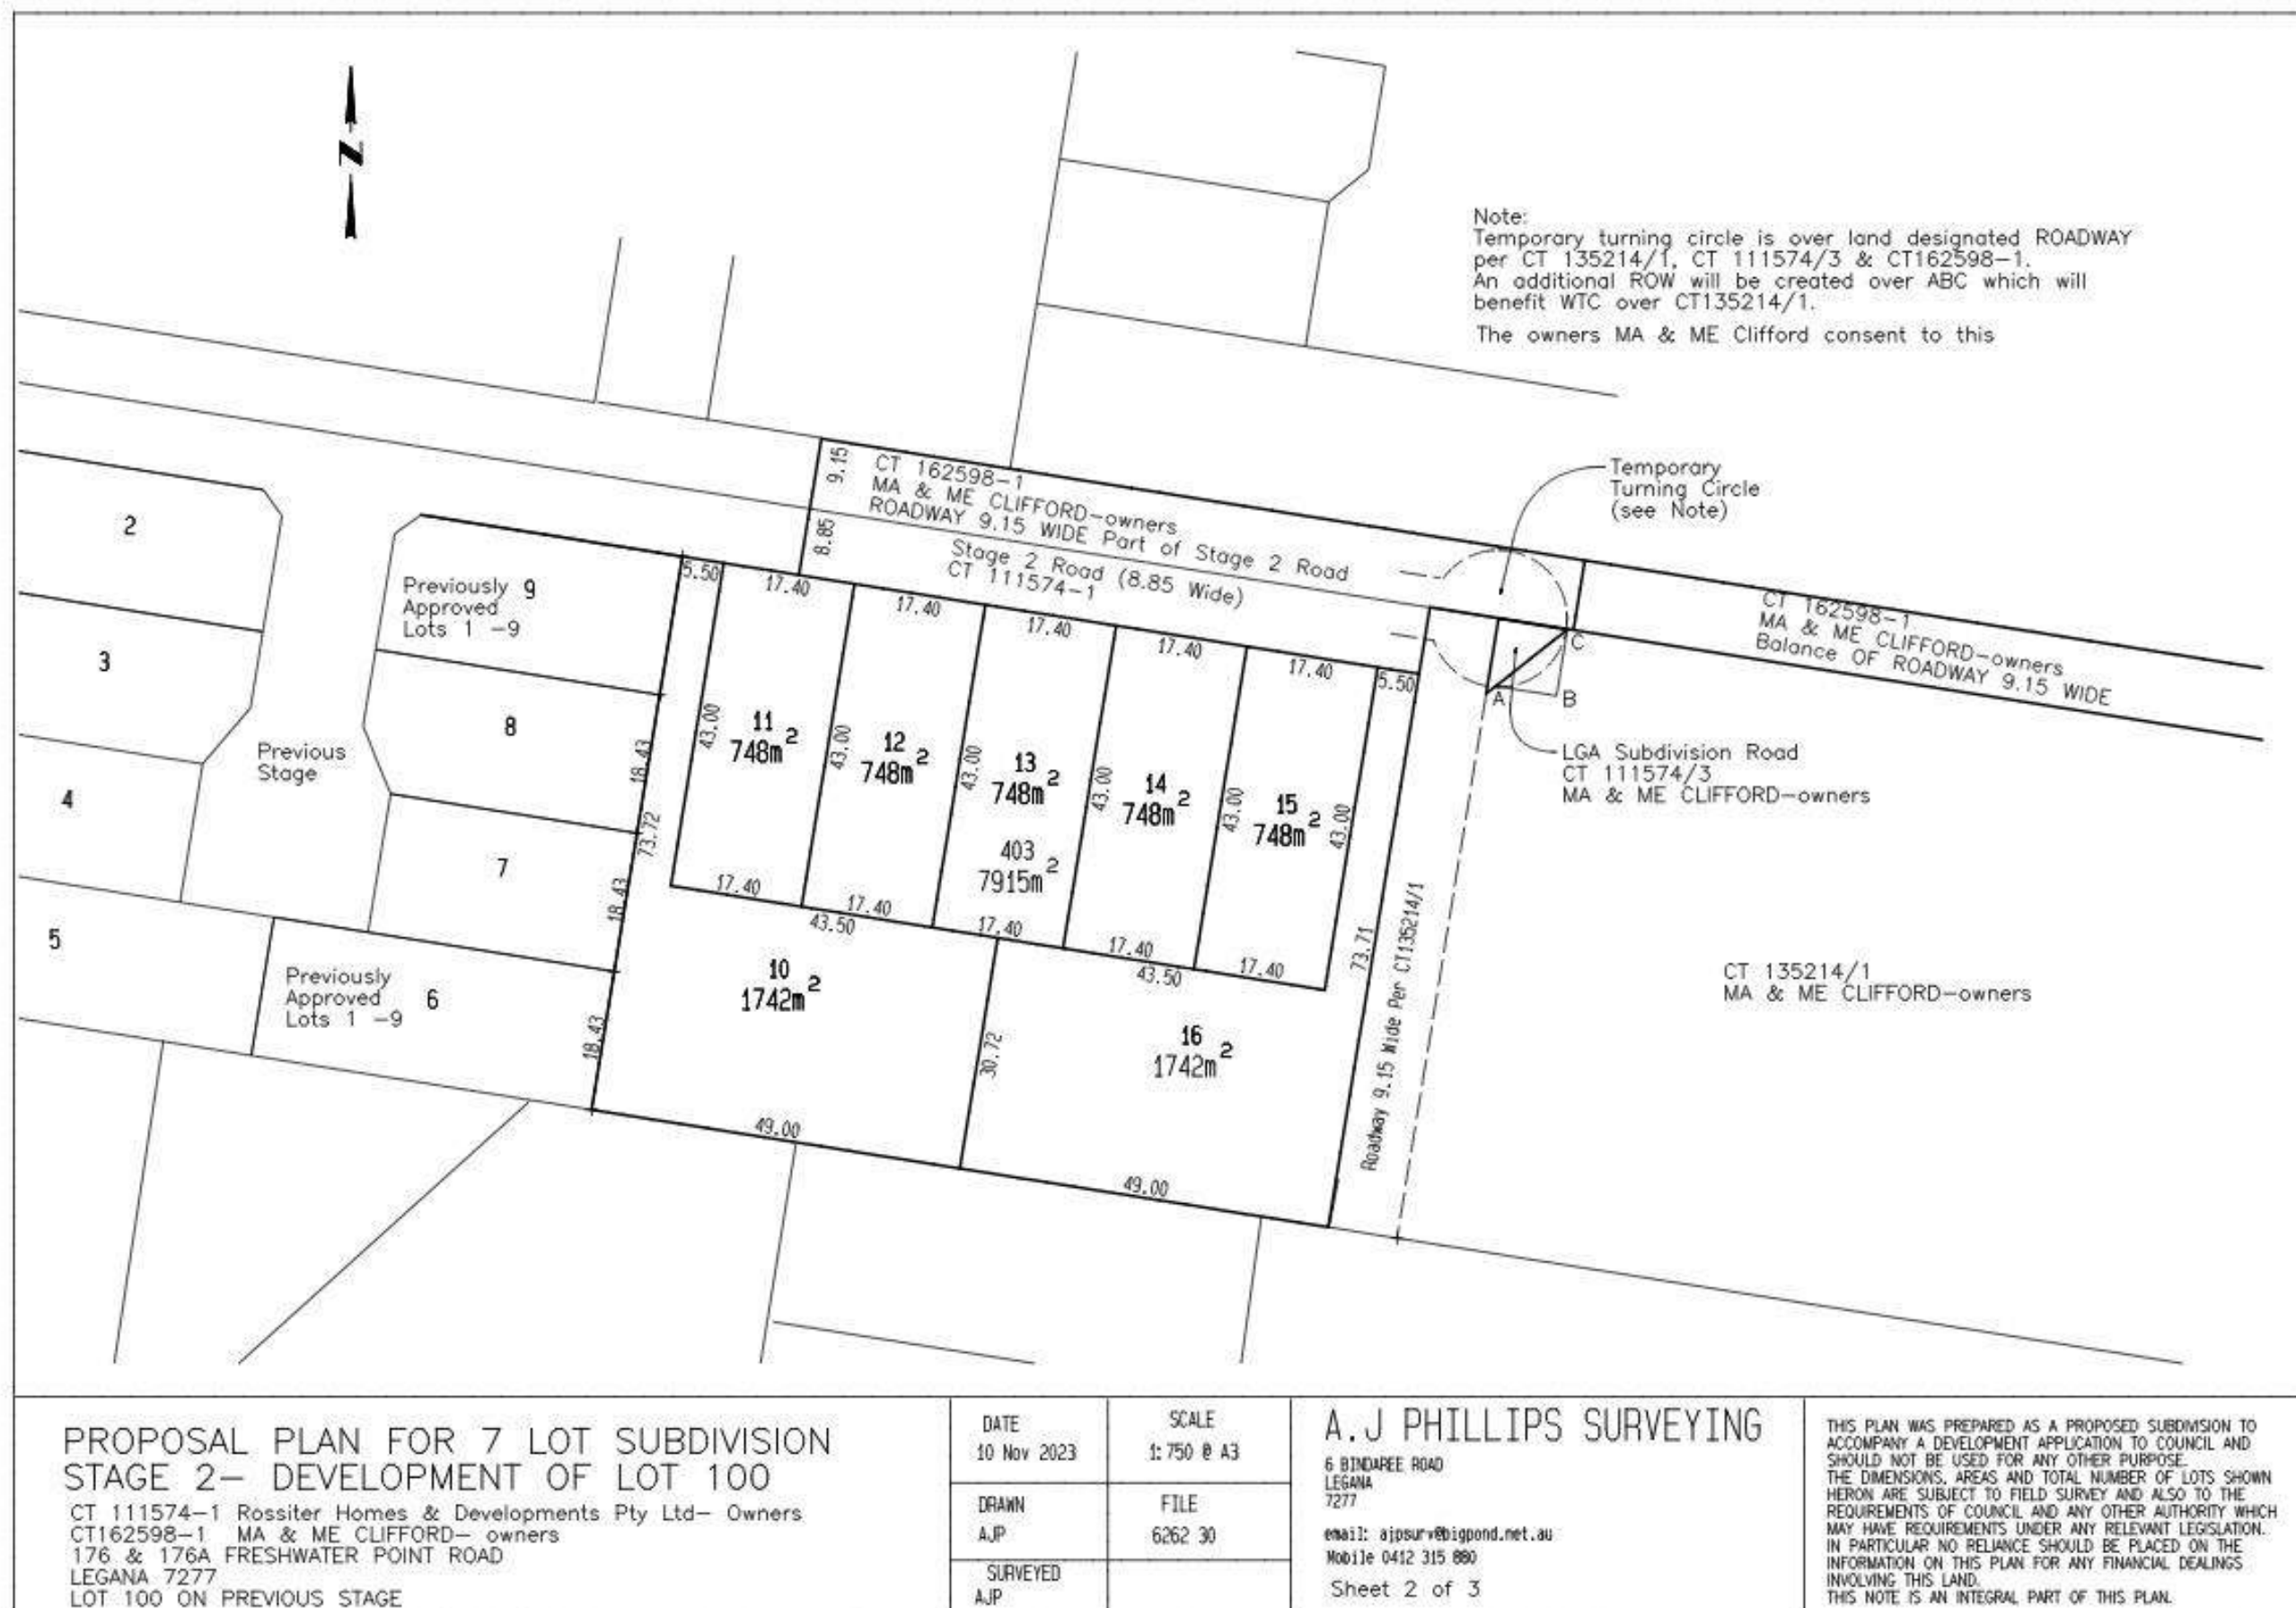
Site Plan for the proposed Stage 2 subdivision (lots 10-16) on 176 Freshwater Point Rd. Note the temporary turning circle proposed to be located on the subject site.
